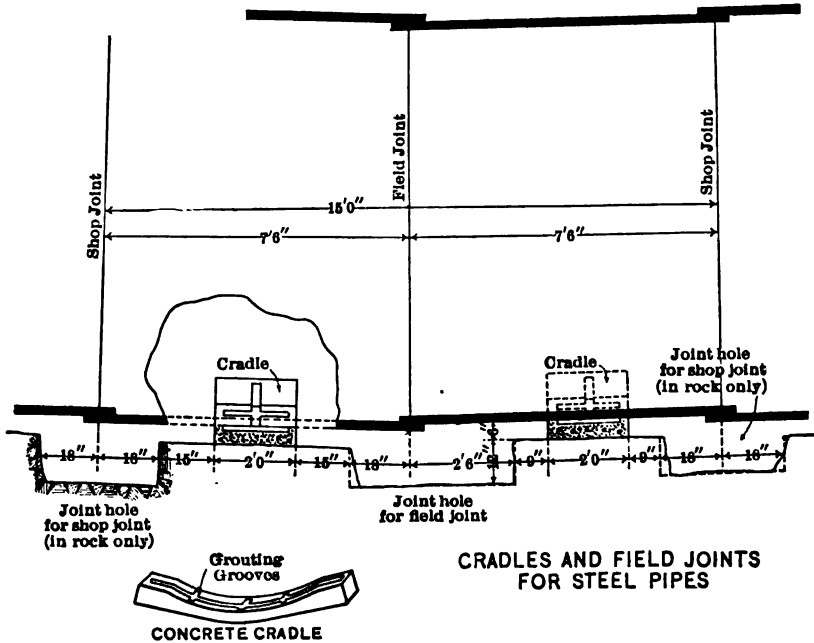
Method of Constructing Concrete Cradles and Excavating Trenches for Field Joints. Contract 68.
